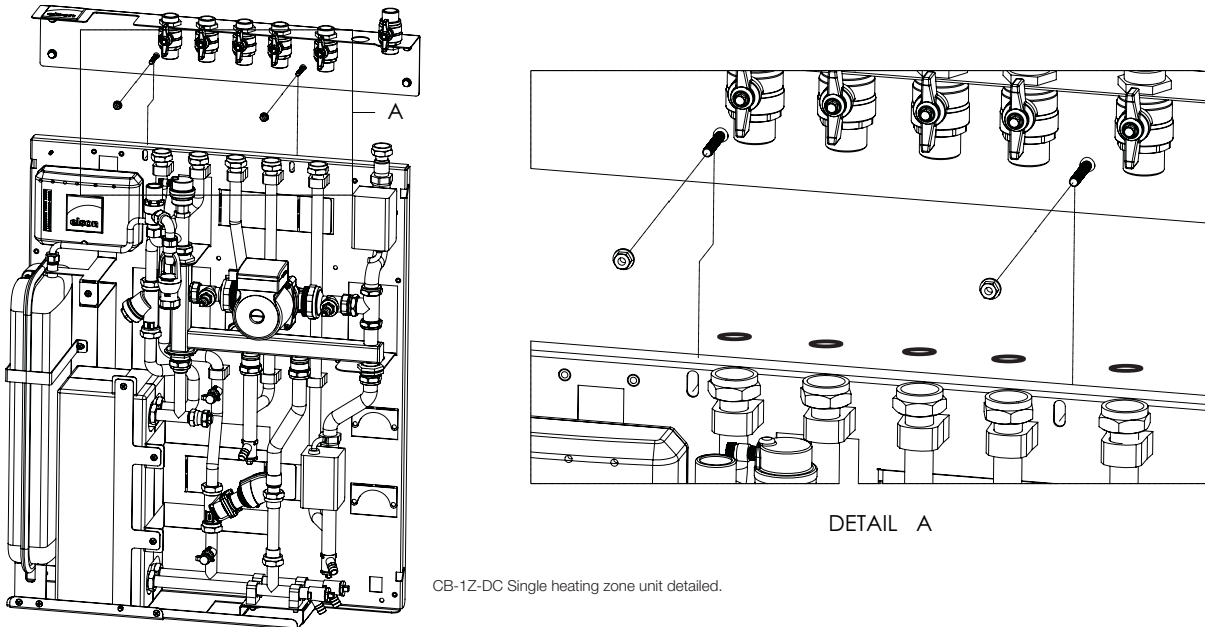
CB Heat Interface Unit - Bottom Support Fixing Points
